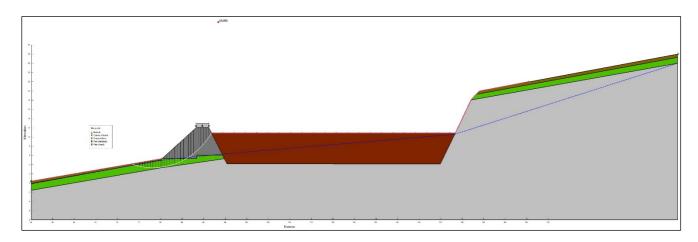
Borrow Pit Stability Check, Undrained DA1C2
